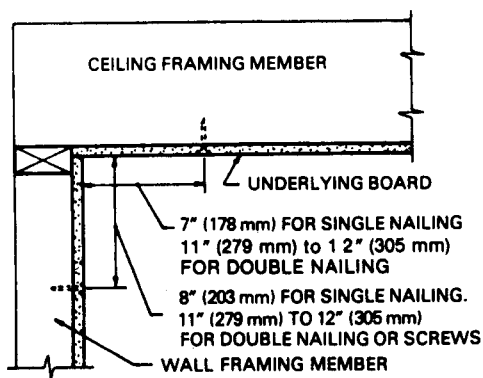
Vertical Section, Ceiling Framing Perpendicular To Wall
